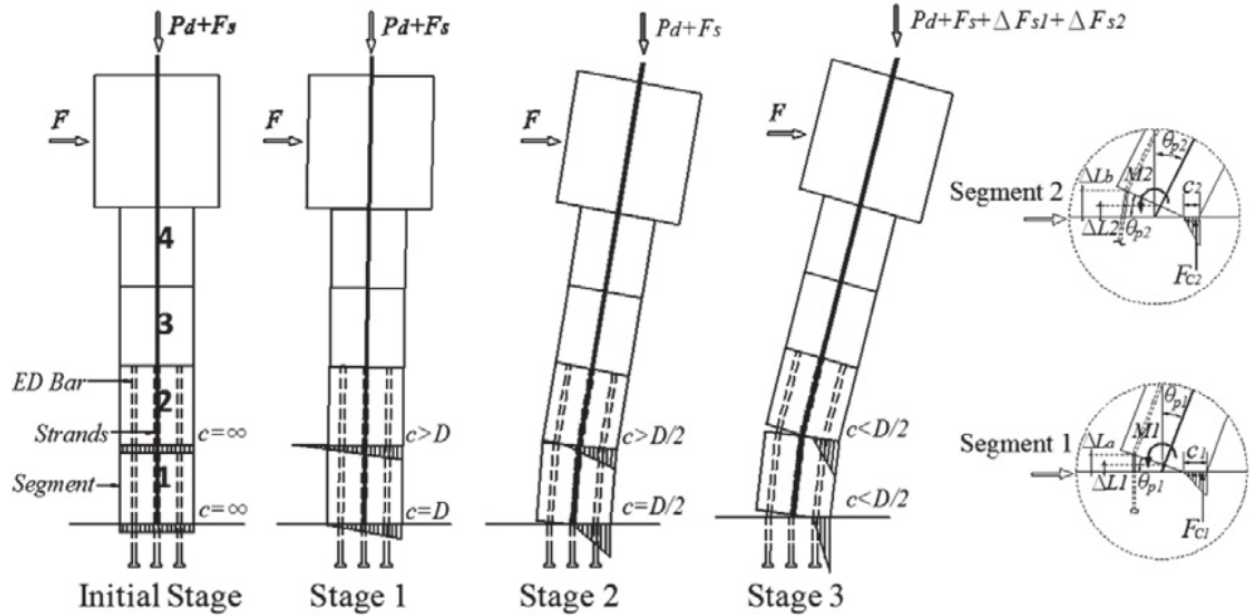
Column deformation under lateral loading. (Chou et al., 2013)
